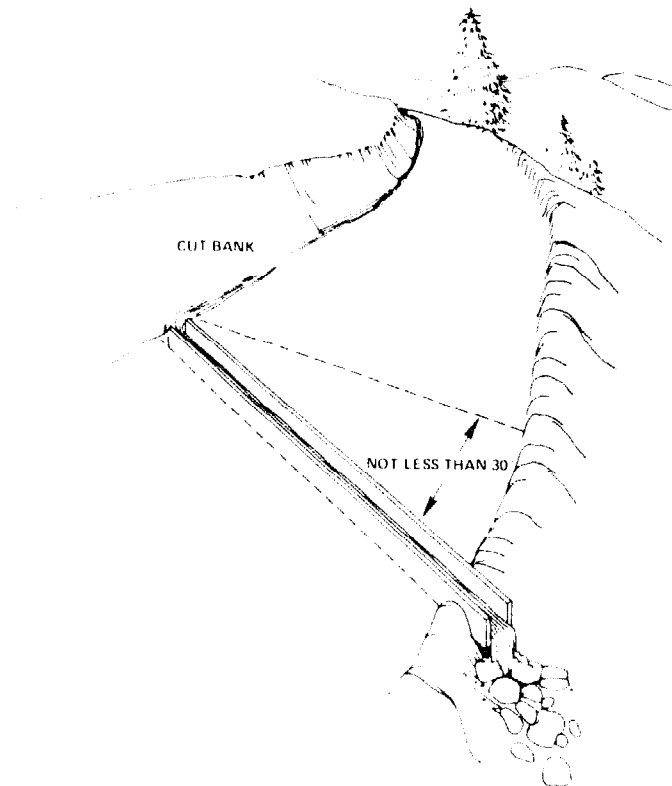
Installation of an open-top culvert. Culverts should be slanted at least 30° downslope to help prevent plugging.
